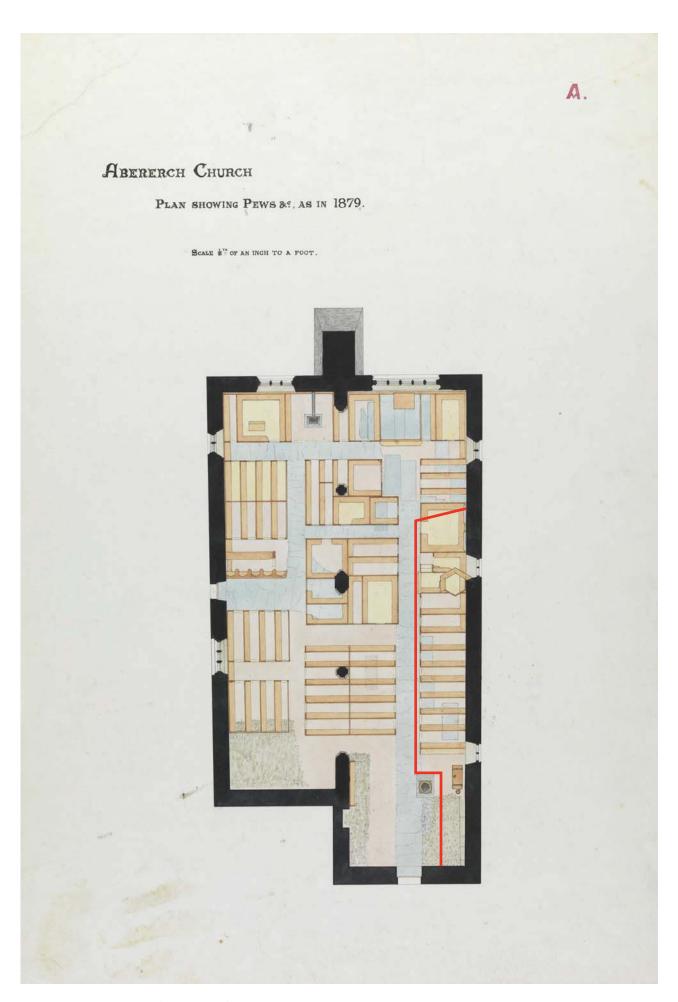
Kennedy's 1879 Plan of the interior of Abererch Church, showing the layout prior to alterations with box pews. Grave slabs are marked in light blue (NLW PD 9702). Approximate study area overlaid in red
